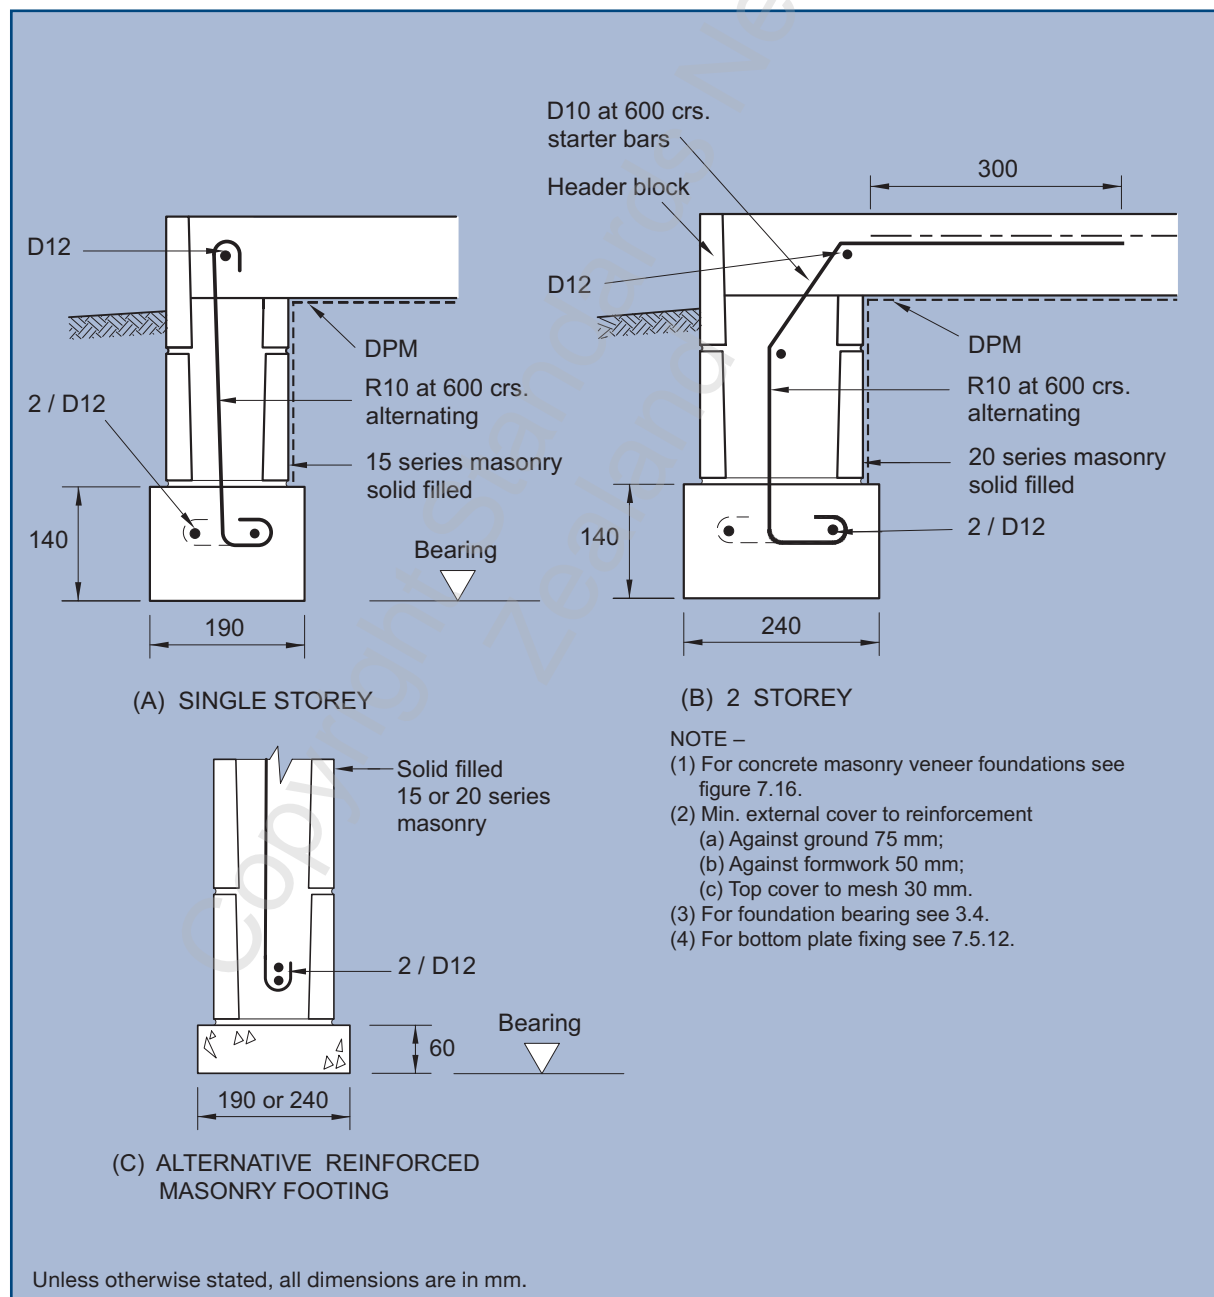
Foundation edge details – Concrete masonry (see 7.5.2.3)
